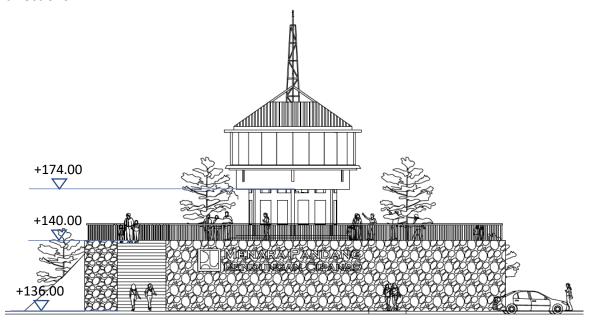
View of the Viewing Tower and Elevation of the Maindam
